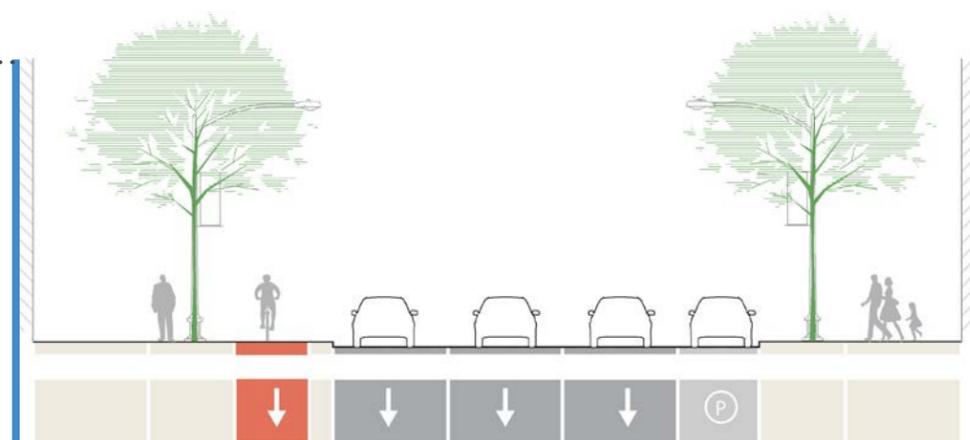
Fifth Street typical section Guadalupe Street to Brazos Street
